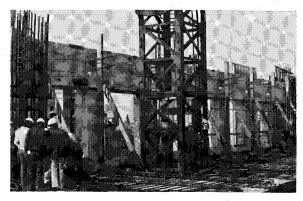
Assembled Vierendeel truss showing diagonal bracing system prior to post-tensioning. Note projecting column dowels and reinforcement for cast-in-place construction.
